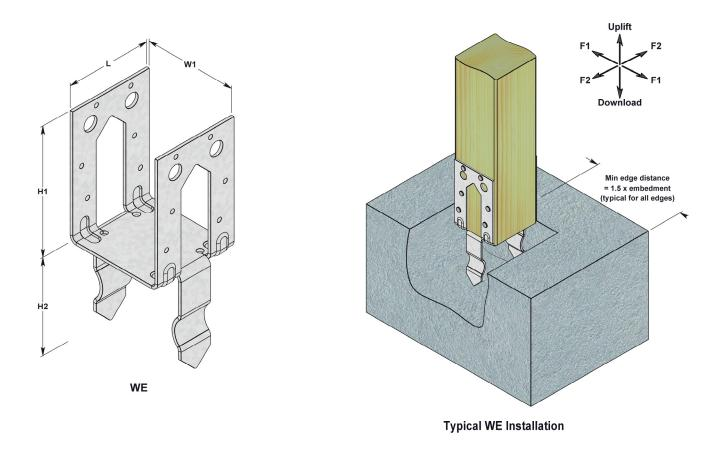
WE WET POST ANCHOR DIMENSIONS AND INSTALLATION DETAILS
